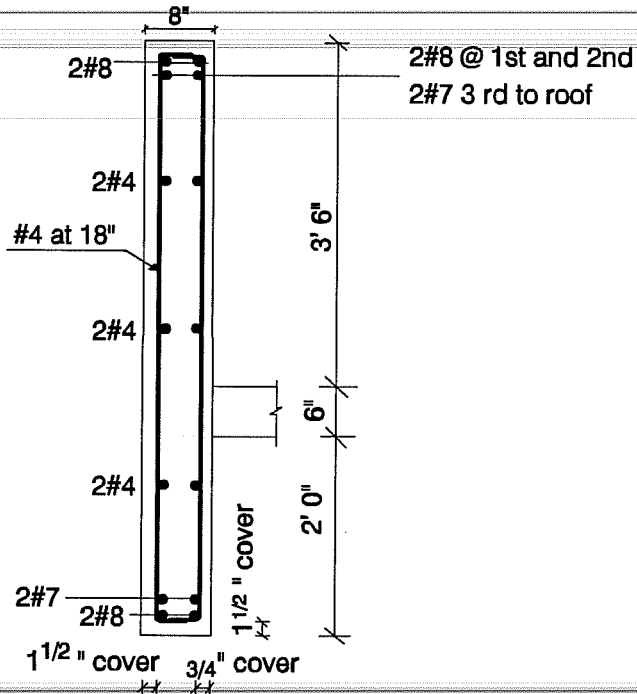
Cross Section of the Seven-Story Building's Spandrel Beams
